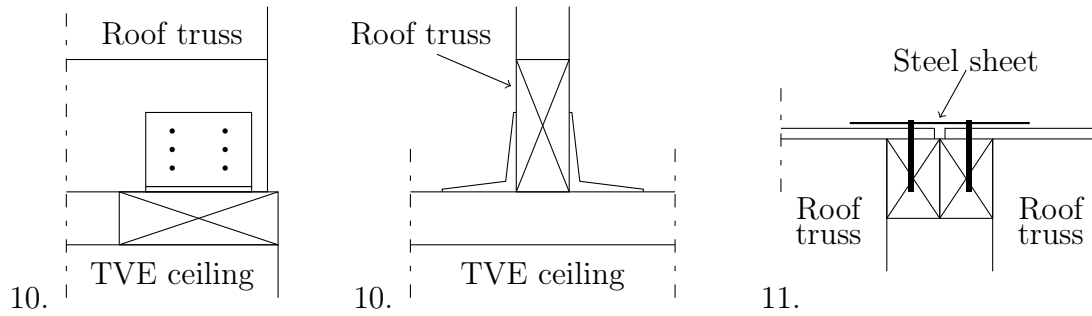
Visualisation of angle brackets between the top TVE and the roof trusses (connection 10), and steel sheets between adjacent roof modules (connection 11).
